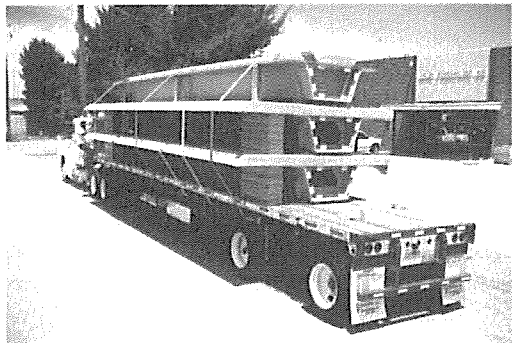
Molded trapezoidal girders (with FRP deck) for the TECH 21 bridge (photo: Martin Marietta Composites)
